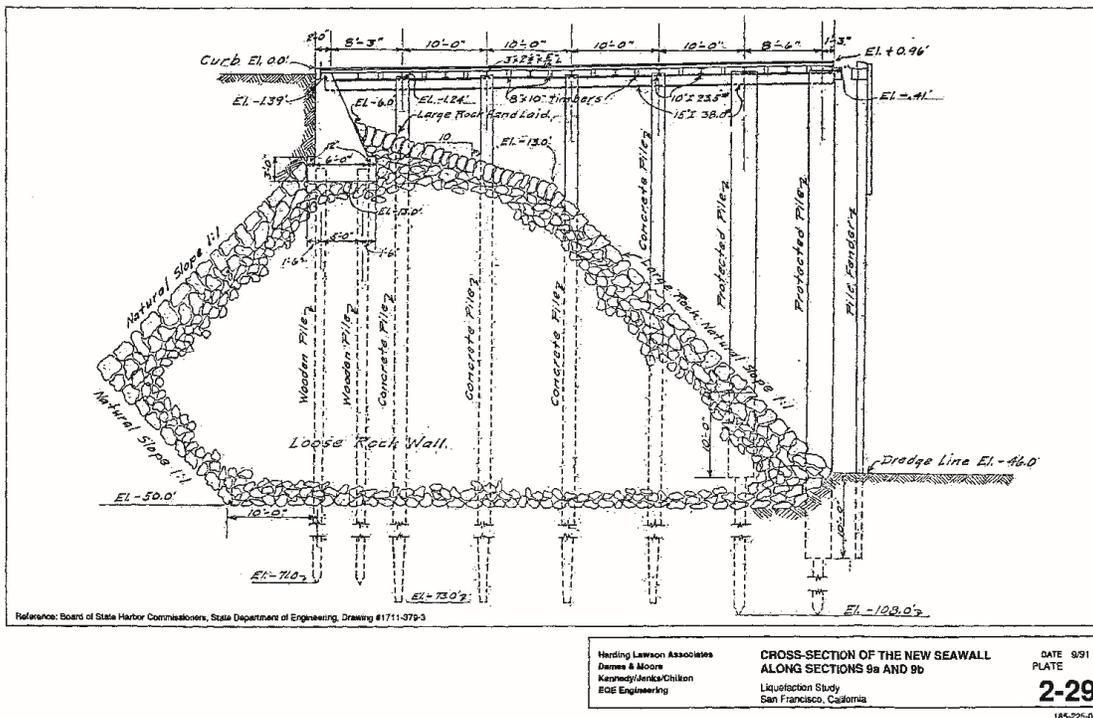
Cross Sections of the New Seawalls along Sections 9a and 9b showing Seawall piles extending to -71 feet (from HLA's 1992 Liquefaction Assessment Report).
